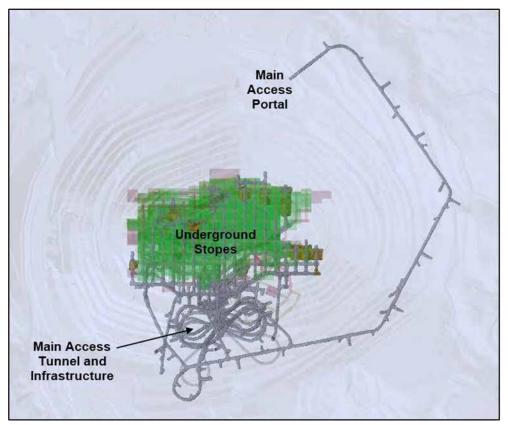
Underground Access and Designs with Final Pit - Plan View
